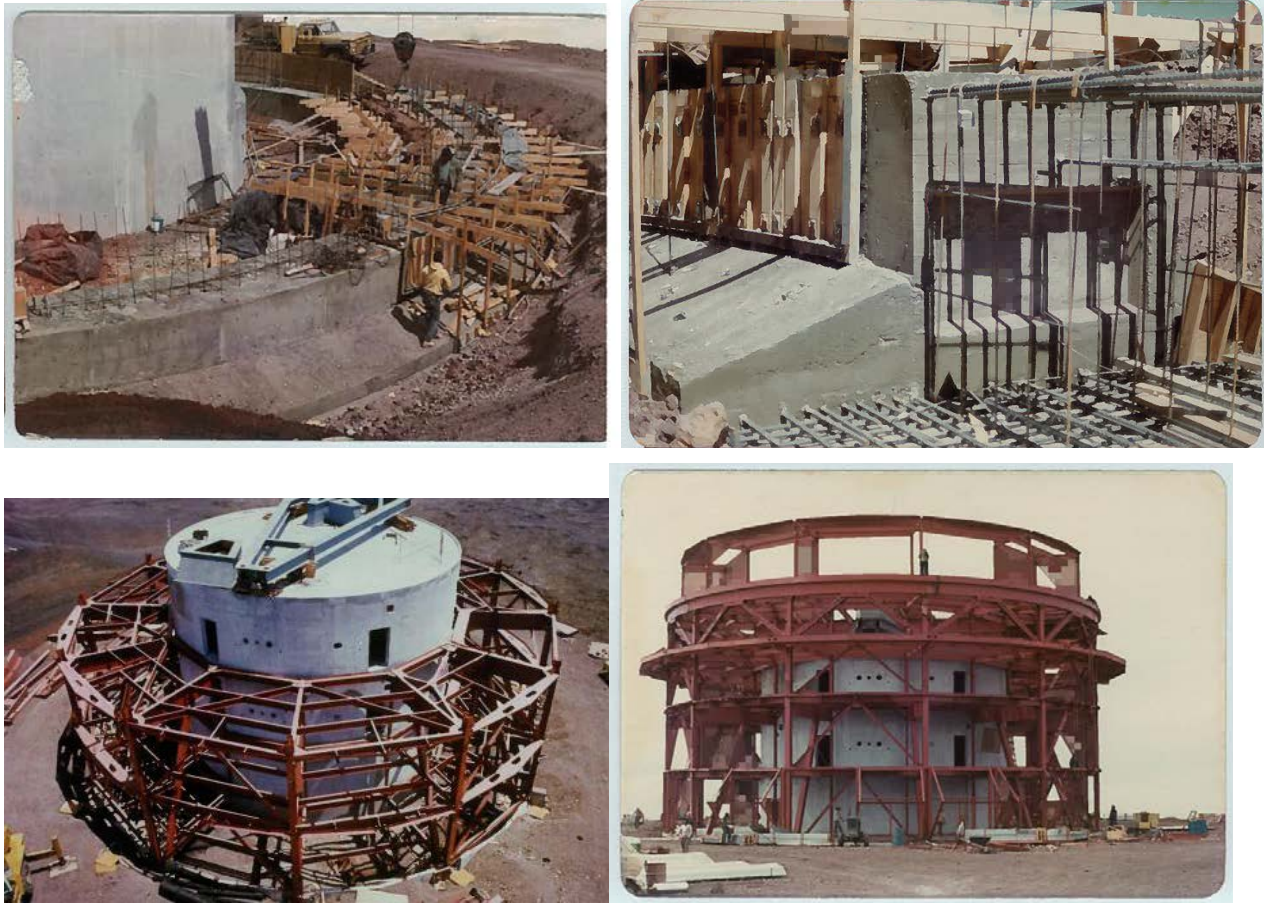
Construction photos of outer building ring foundation (top) and main steel building structure (bottom)
